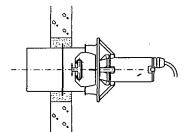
Circulation pump type SR. Installation on wallpipe and with guide rails.
